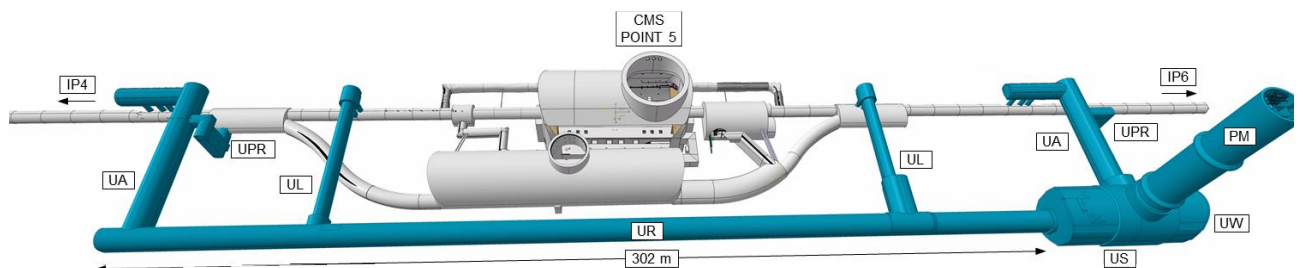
Top view of the HL-LHC underground Civil Engineering infrastructures as it would appear in IP5 with the relevant underground code names.
